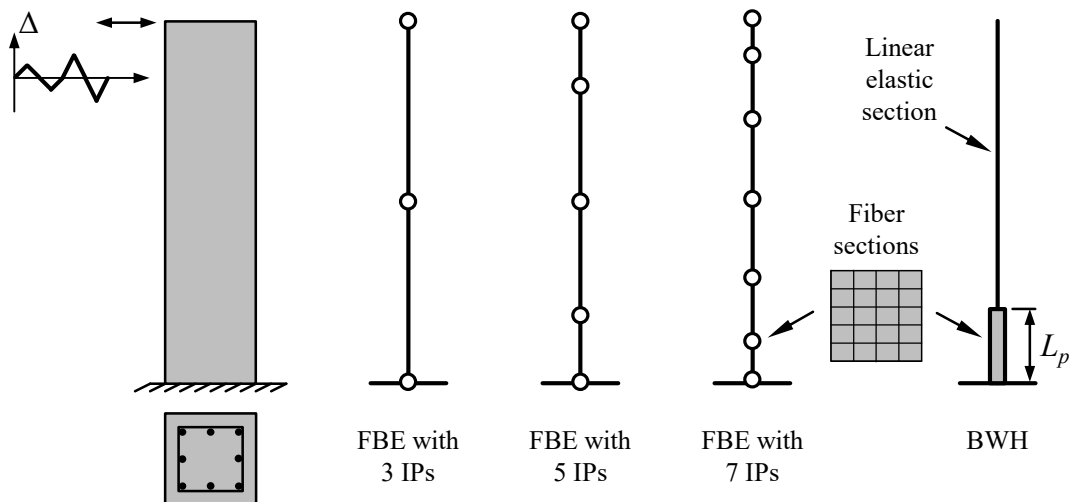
Schematic view of test specimens and implemented element modeling approaches
